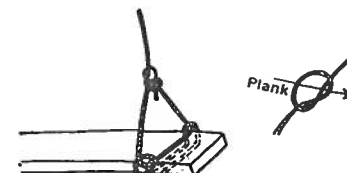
Scaffold hitch. For suspending a scaffold plank. Will prevent plank from tilting. Can also be used on plank on edge.
